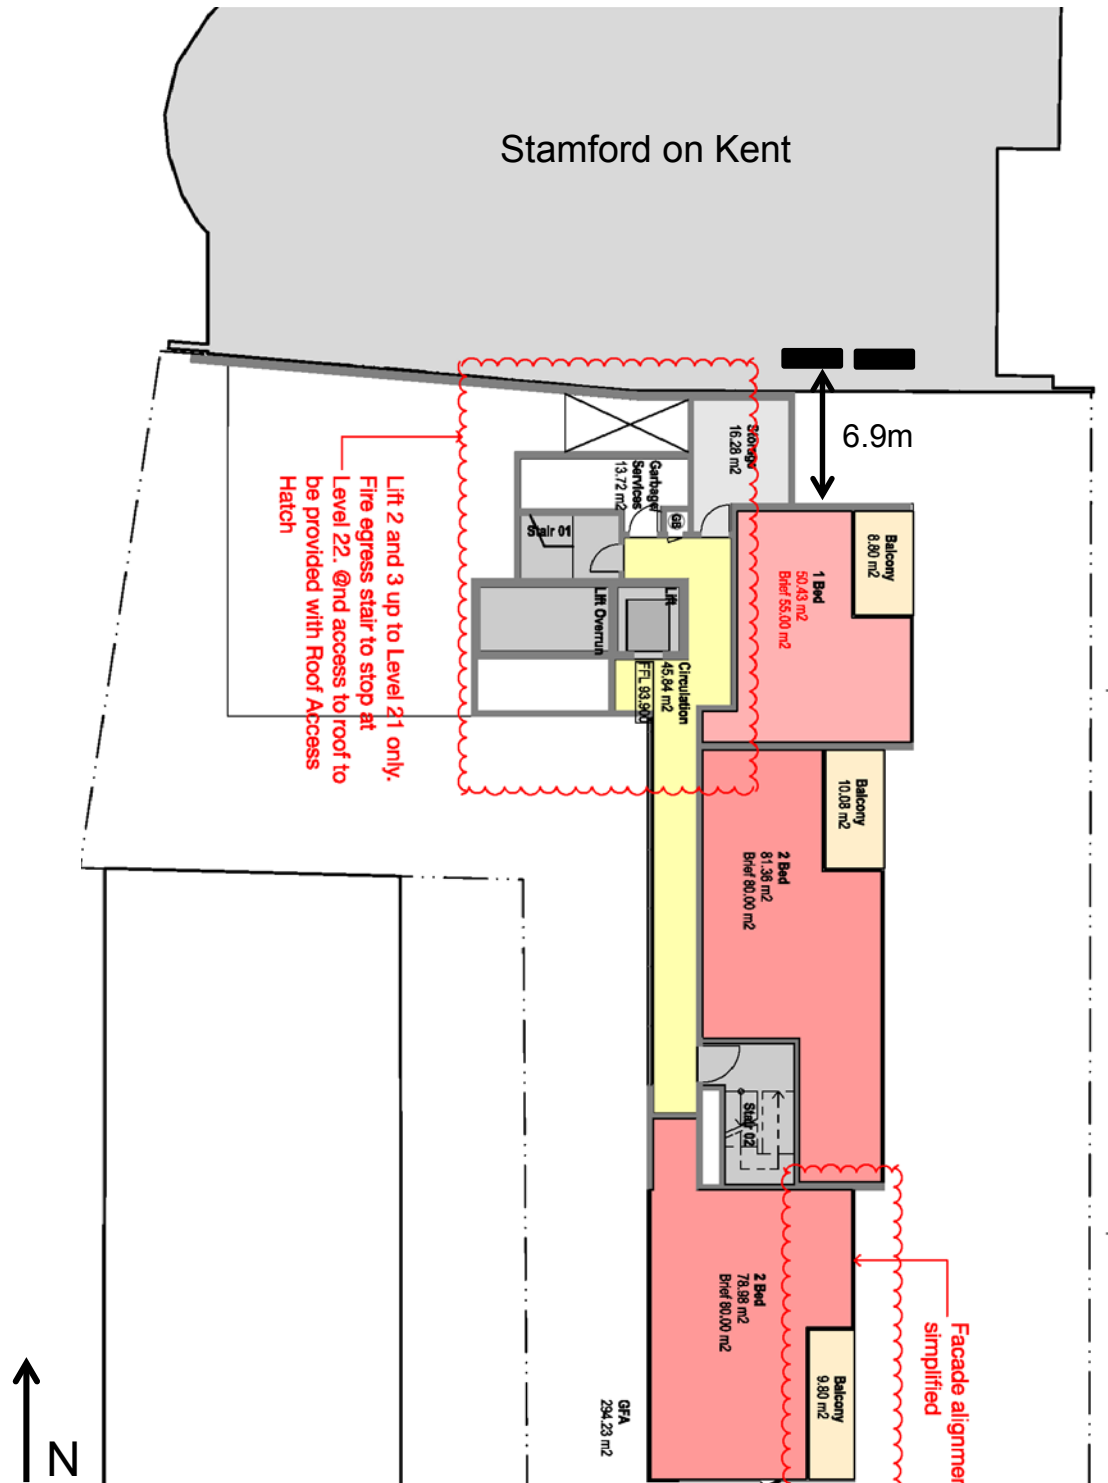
Approximate location of SOK windows in relation to subject site (above Level 16)
